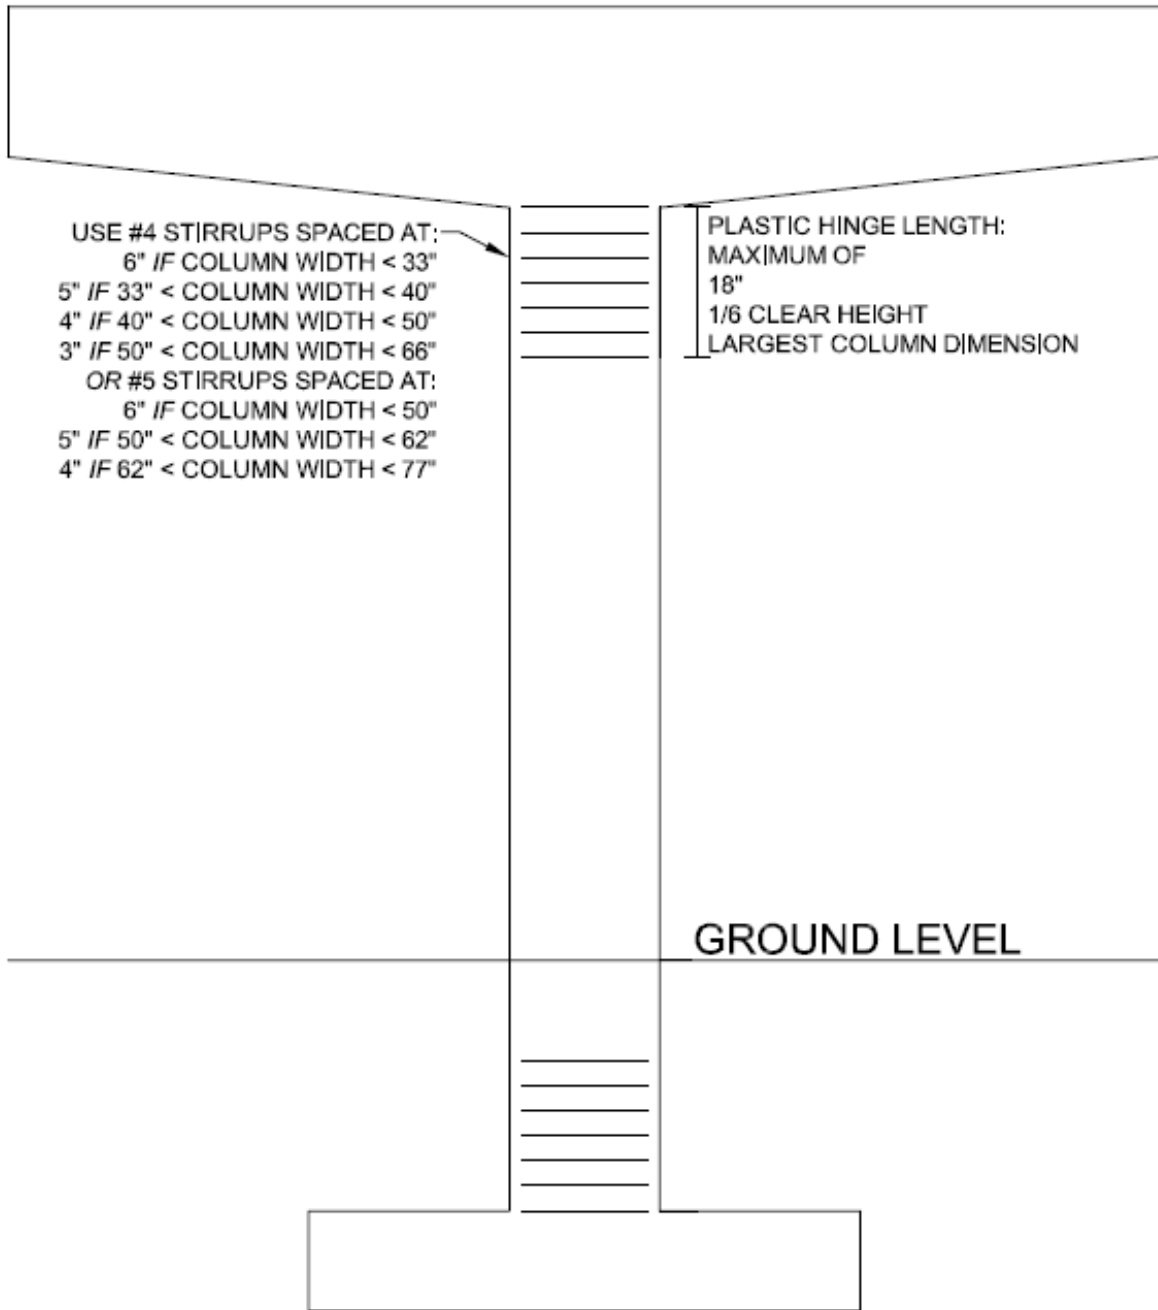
Standard Details for Rectangular Columns in SDC A2
